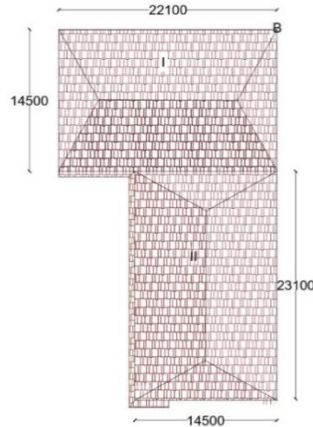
7 Layout of Second Floor Roof of Umar Dormitory (Building G)
